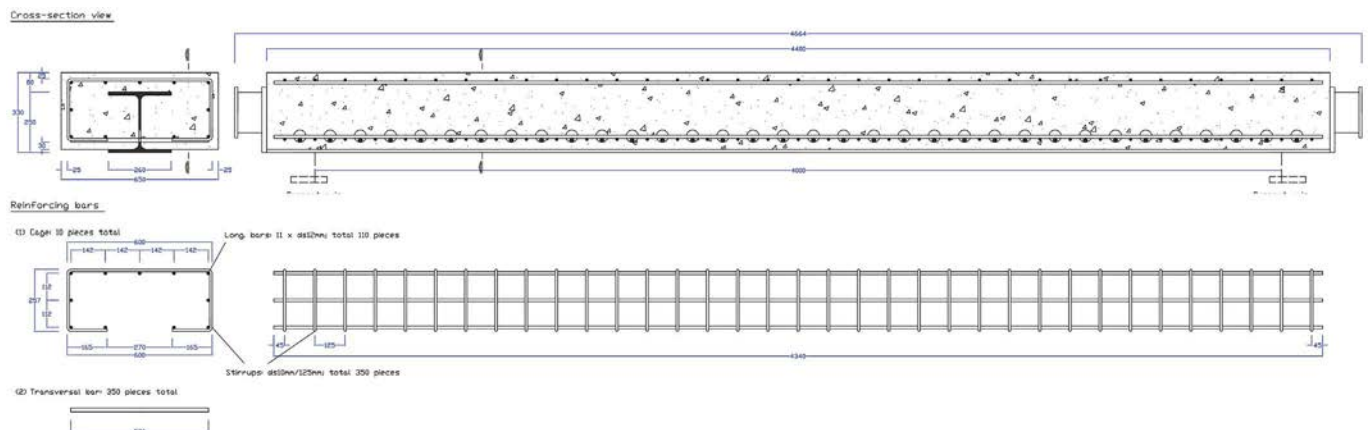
Cross and longitudinal section of the beam and reinforcement disposition.
